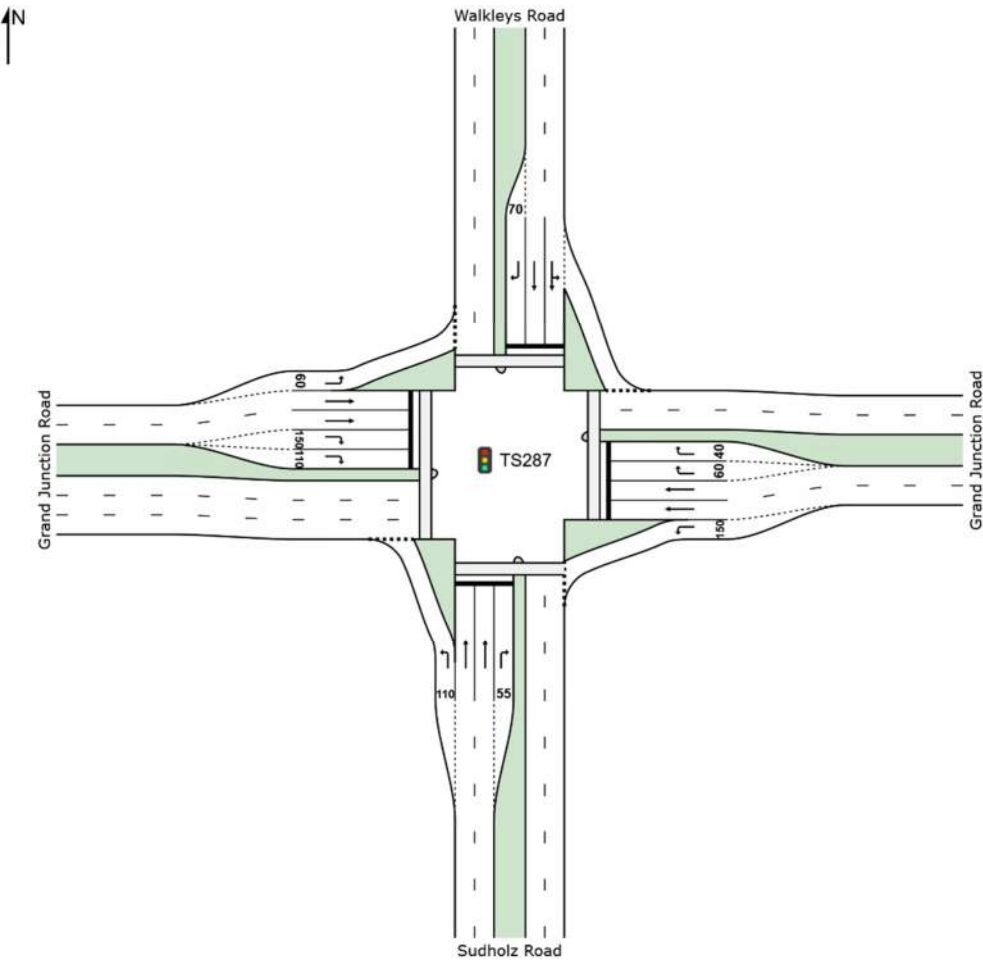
Sudholz Road / Grand Junction Road, suggested modified layout
